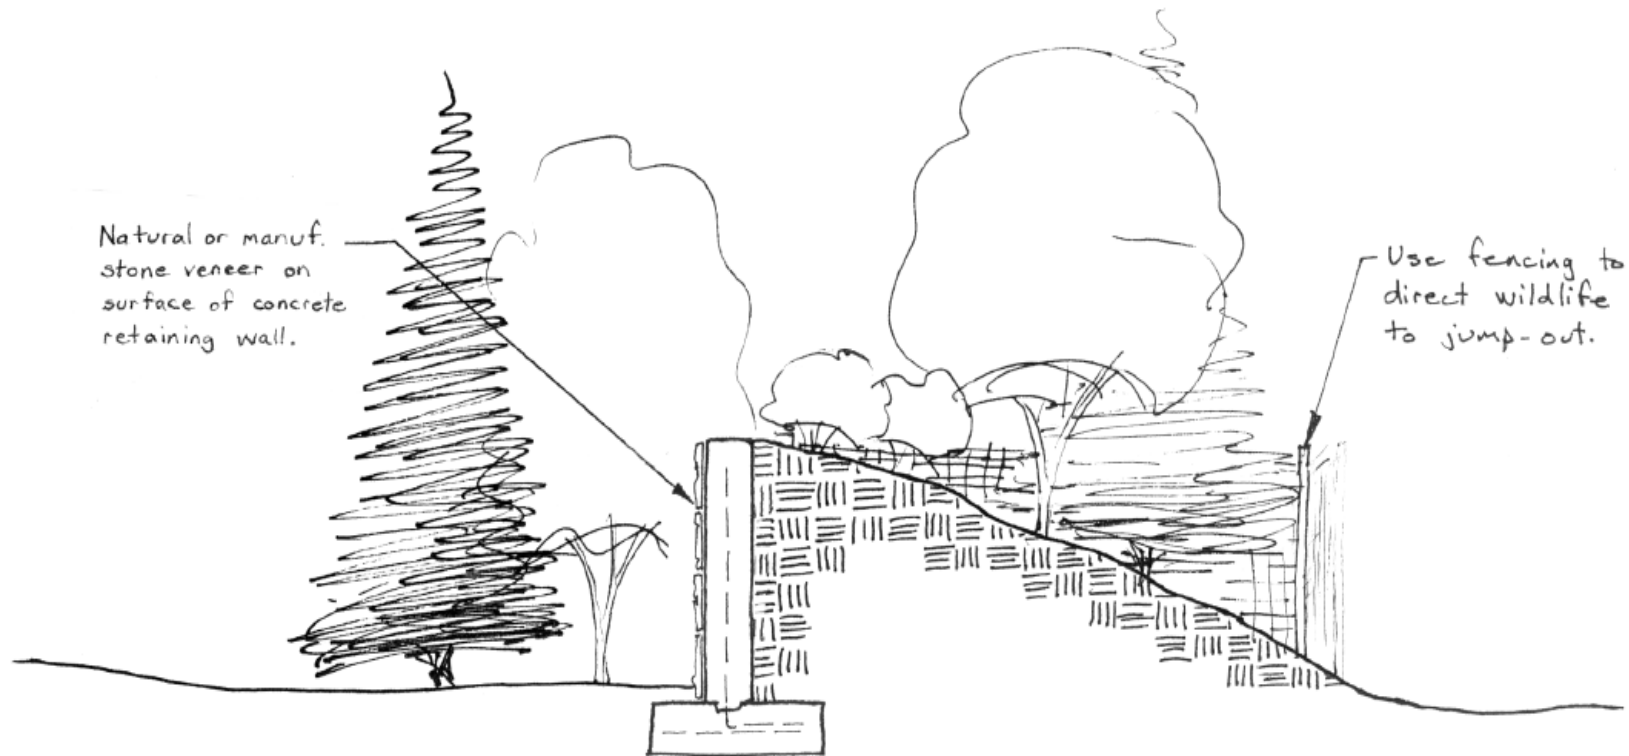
Wildlife jump-out typical details provided to US 93 design consultants (Jones and Jones 2002b).
